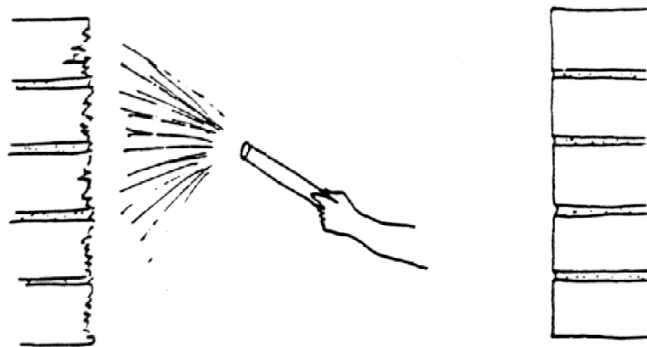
Sandblasting damages masonry and is not recommended.
